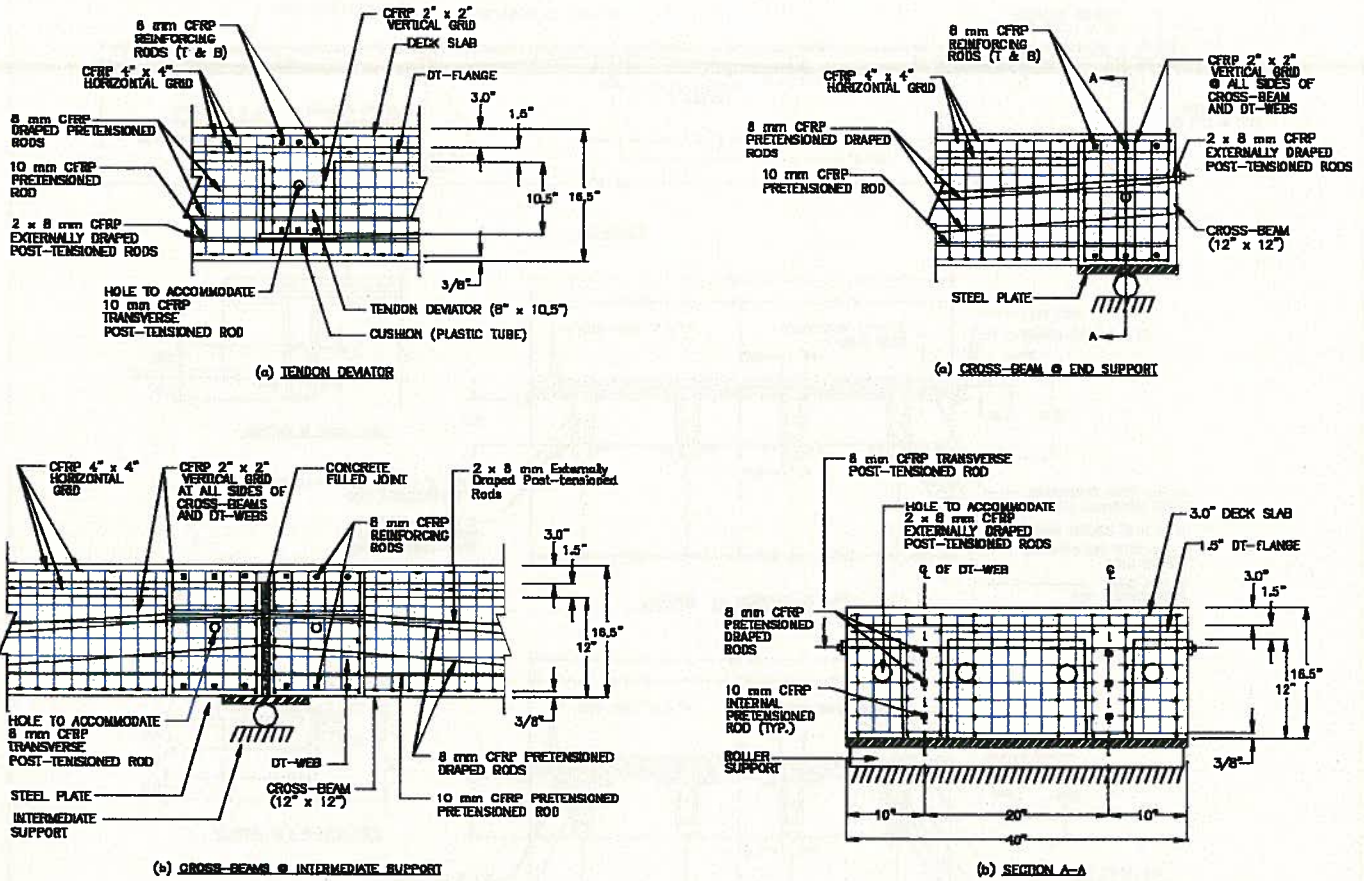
Details of tendon deviator and cross-beams at intermediate support of bridge model CDT1.
